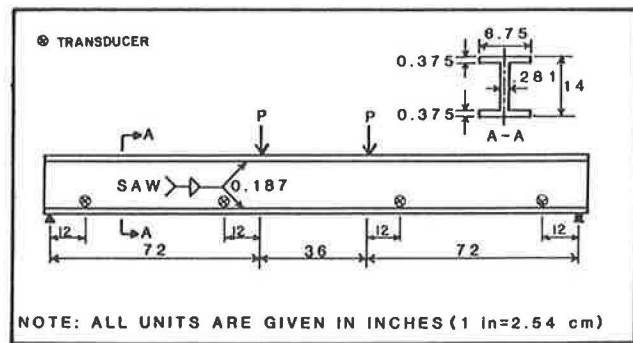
Geometrical configuration of welded beam specimens.
